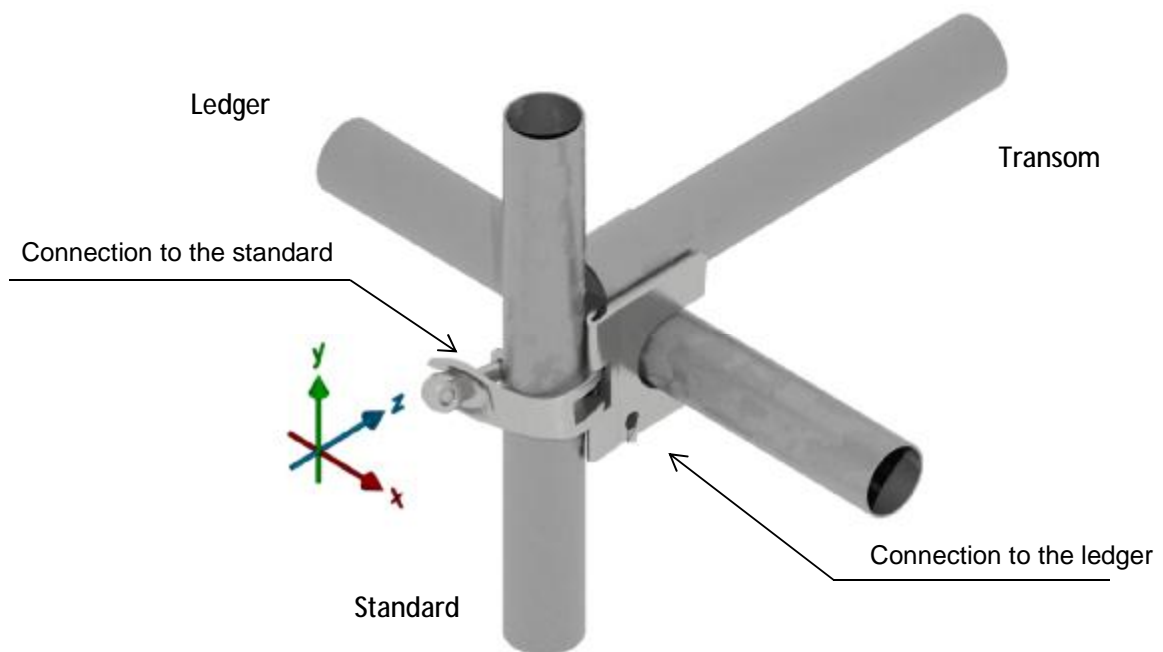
Typical prefabricated structural transom connection showing xyz axes
